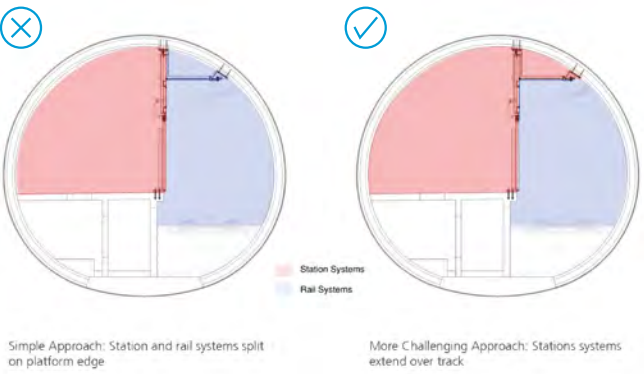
Platform Tunnel Space Planning: Station and Rail Zones
